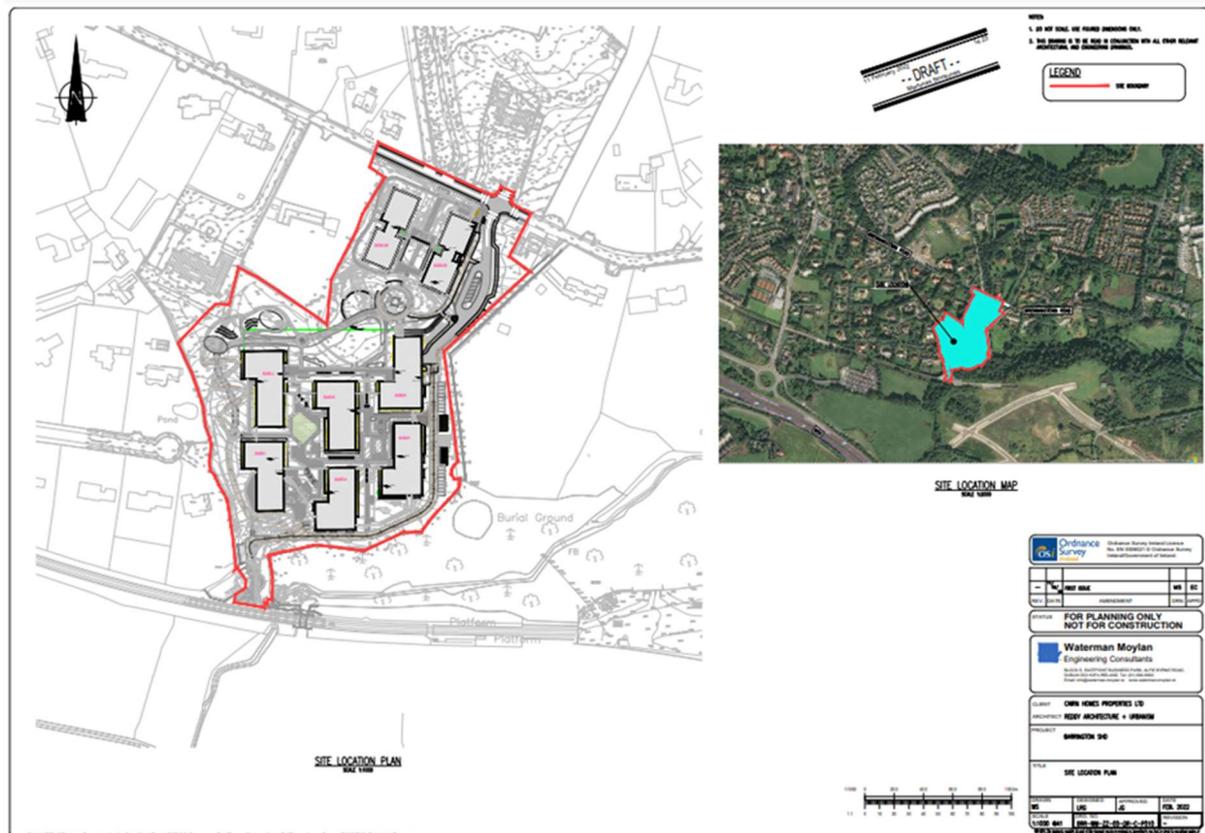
Site Location and Layout (Waterman Moylan, 2022 Drg No P010)
